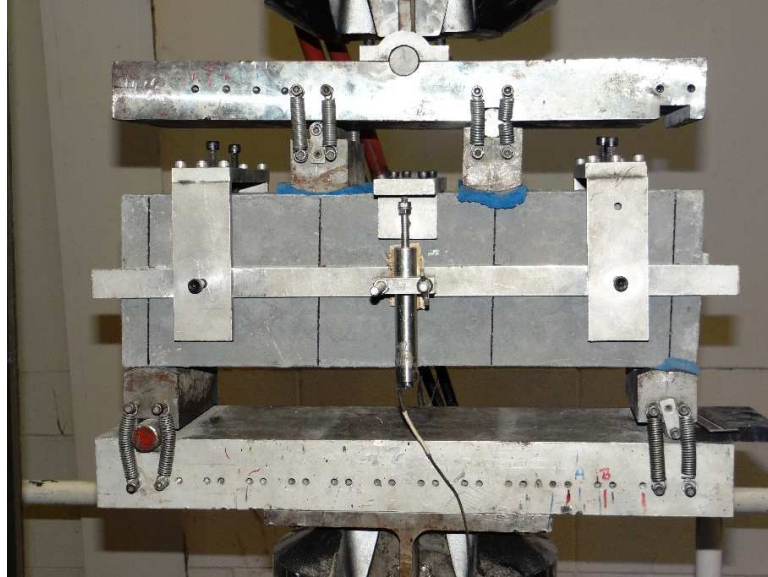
Three-Point Loading Test Setup (ASTM C1609)
